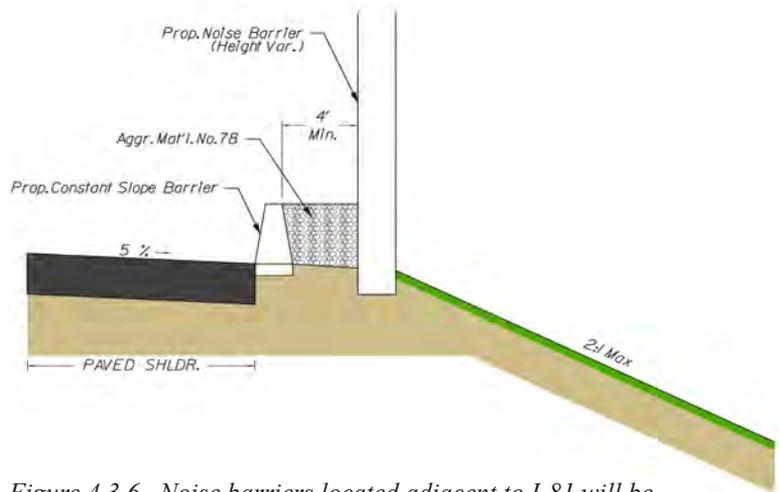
Noise barriers located adjacent to I-81 will be protected with constant slope barrier and incorporate the gap required by VDOT Road Design Manual
